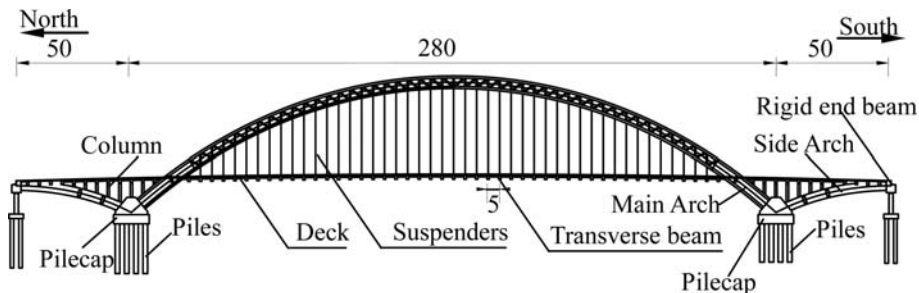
Elevation view for Dong-Guan Waterway Bridge (Unit: m).
